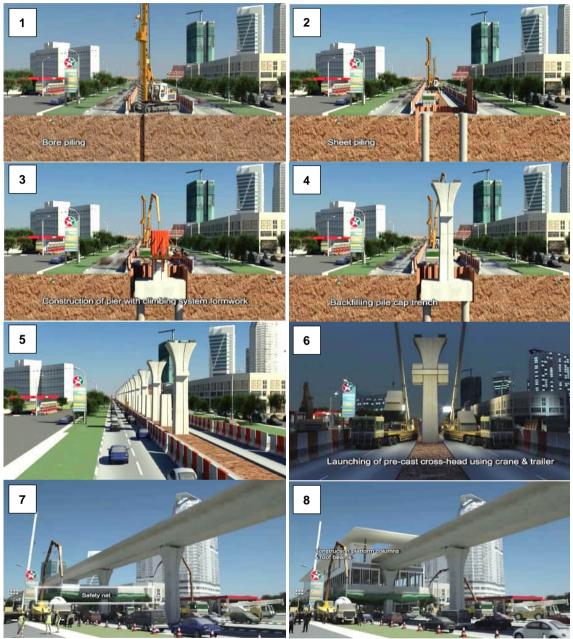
Example of elevated viaduct construction associated with station box [W-33]
